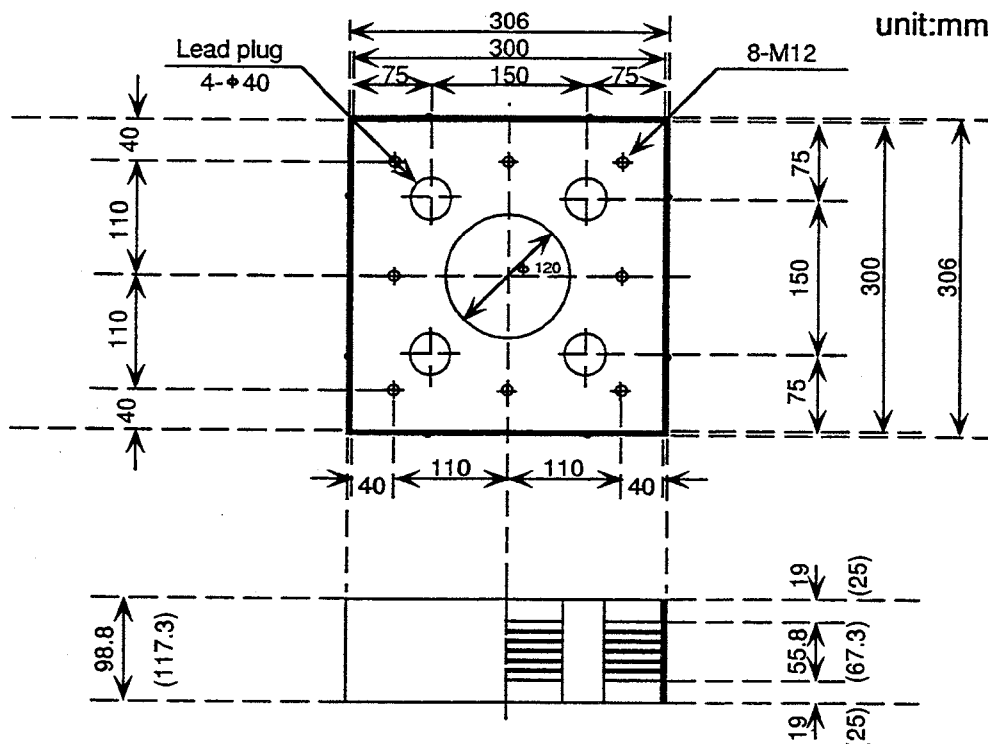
Dimensions of Specimens (Inside parenthesis: type B)
